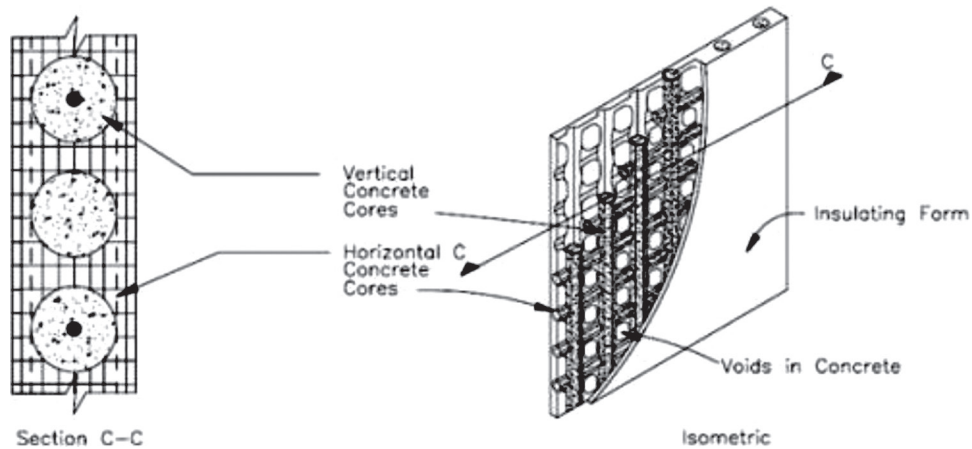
Screen grid ICF wall system and plan view Section C-C.
